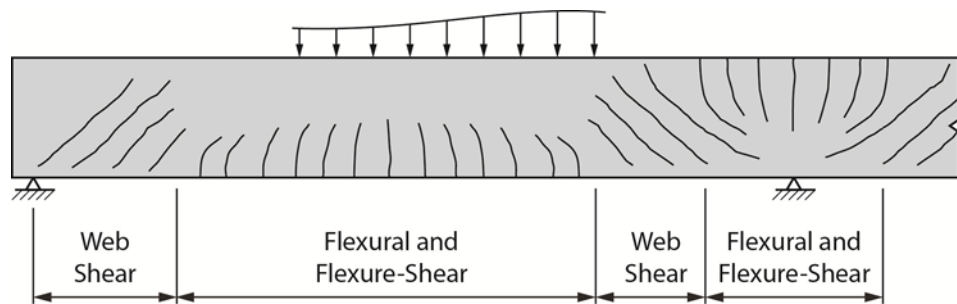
Types and Locations of Reinforced and Prestressed Girder Cracking
